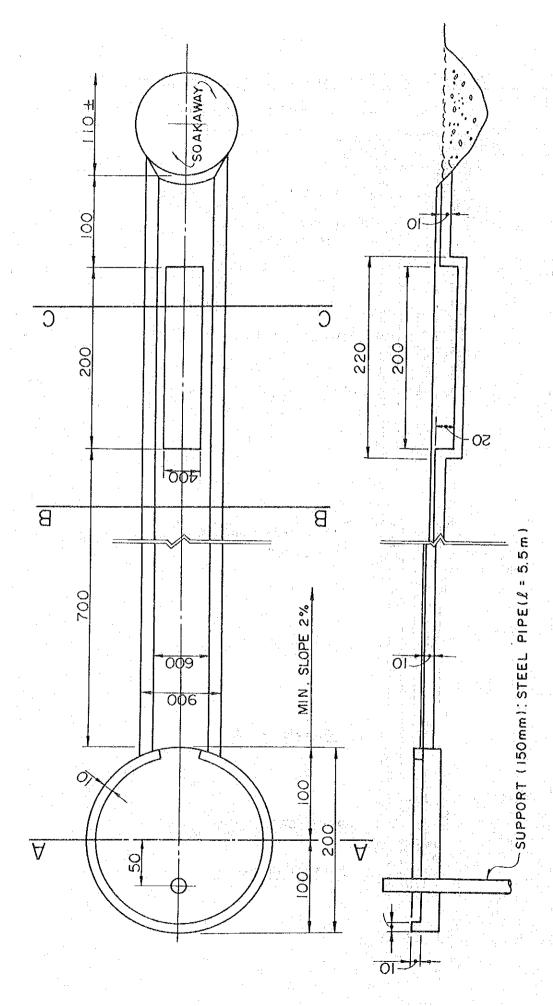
(1) PLAN AND PROFILE OF HEAD WORKS
